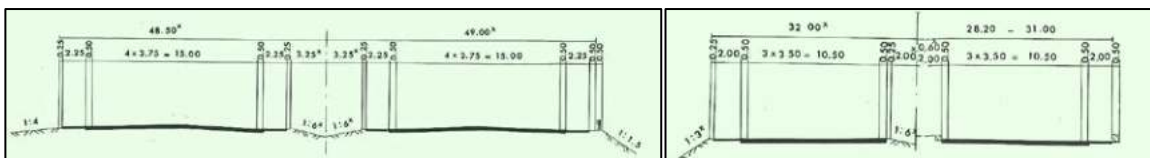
Variations of a 98-metre wide highway cross-section (left) and a 63-metre expressway road cross-section (right) in the Helsinki study (WSPP 1968, 300)
